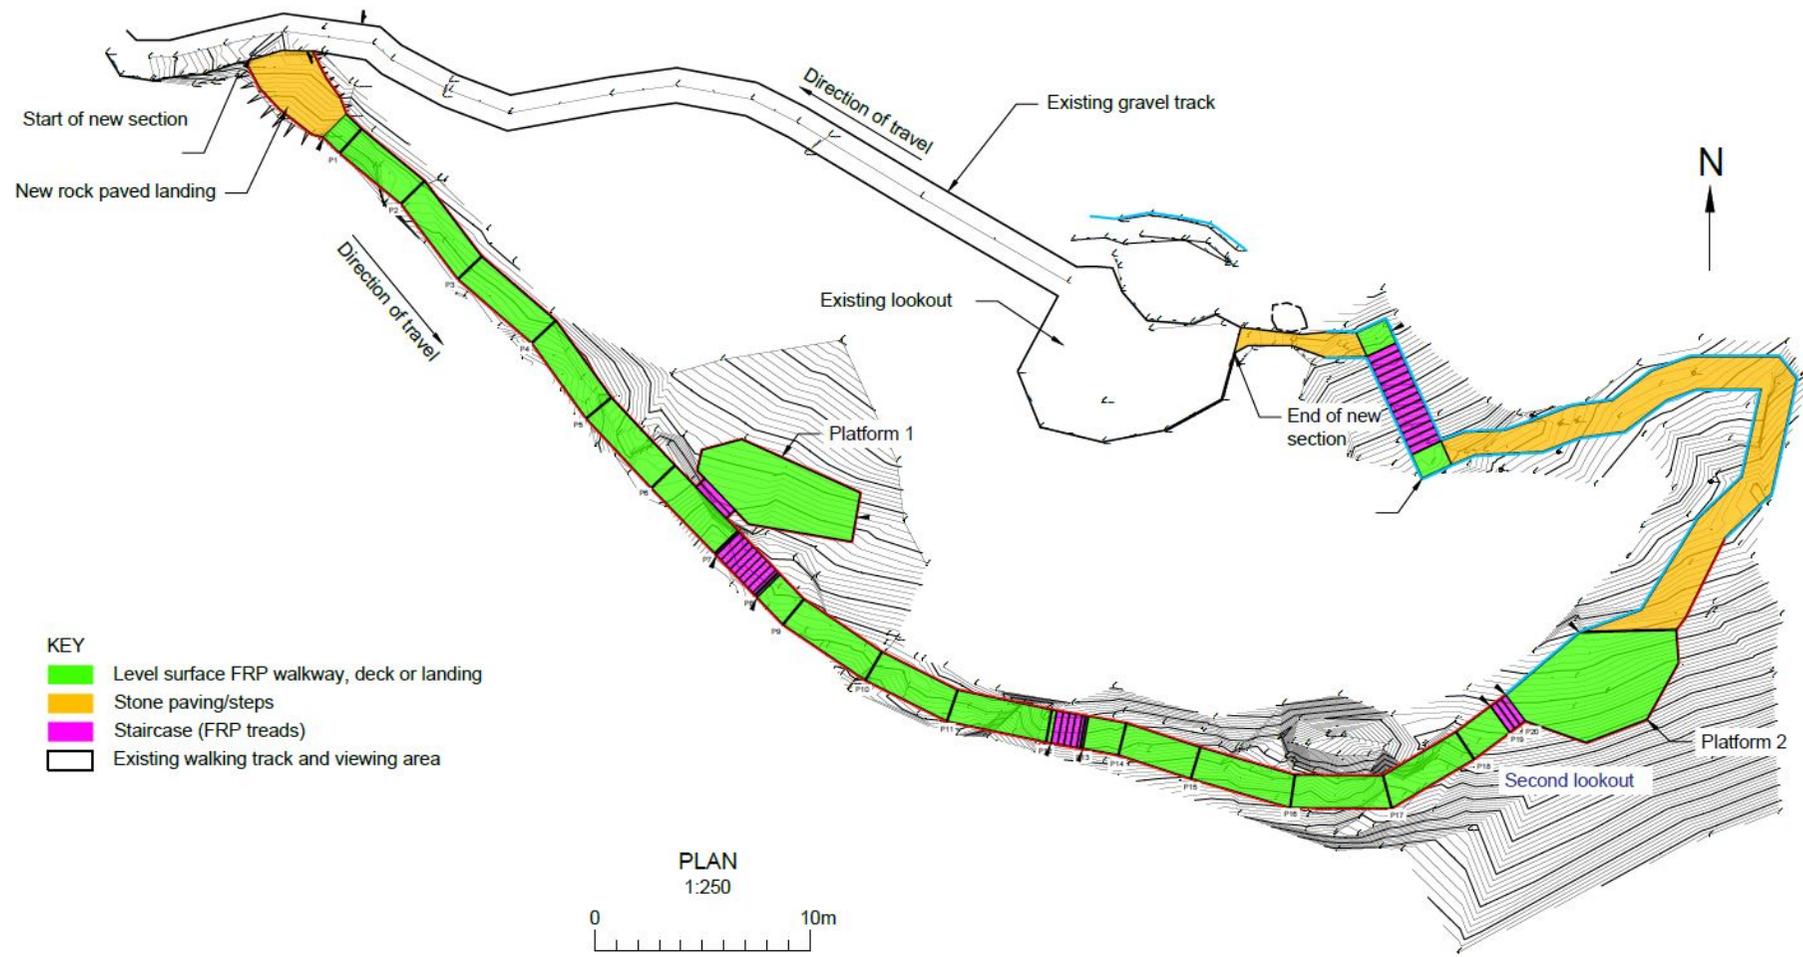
Preliminary design of track extension and platform plan (indicative route only)
